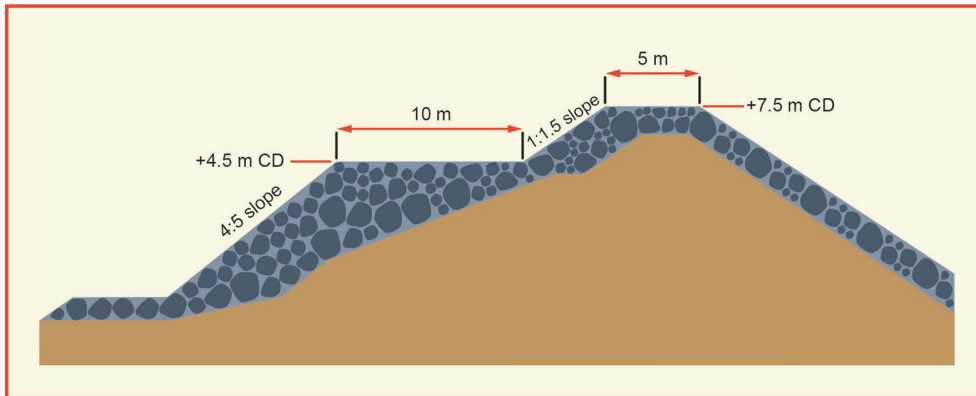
Typical cross-section of the berm breakwater – Case Study 9
